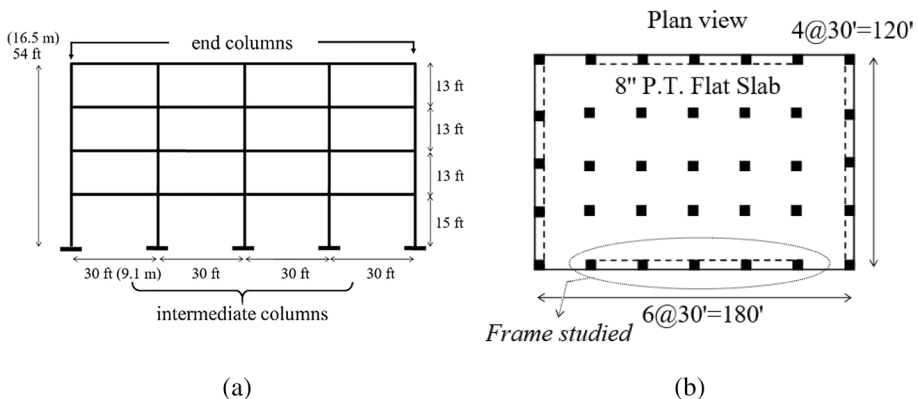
Four-story reinforced concrete building: a elevation of the perimeter moment resisting frame and b plan view of a typical story (adopted from Aschheim et al. 2019)
